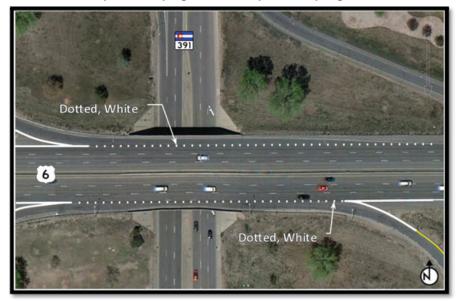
Proposed Striping – US 6 Overpass at Kipling Street
